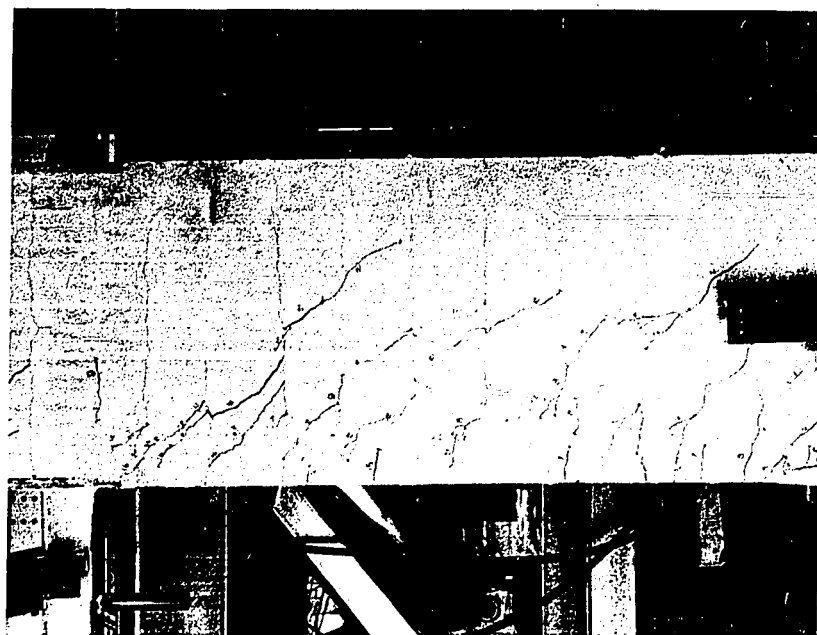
CRACKING IN THE SHEAR WALL
